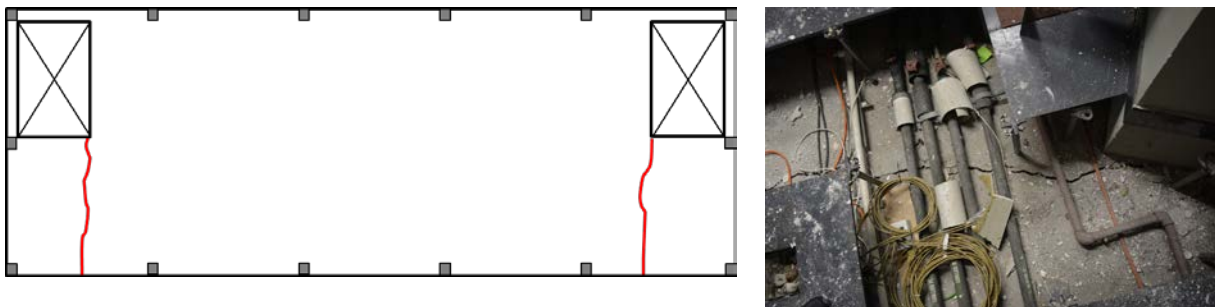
Generic illustration (plan view) of rectangular perimeter moment frame building with diaphragm failure at openings for stairwells
